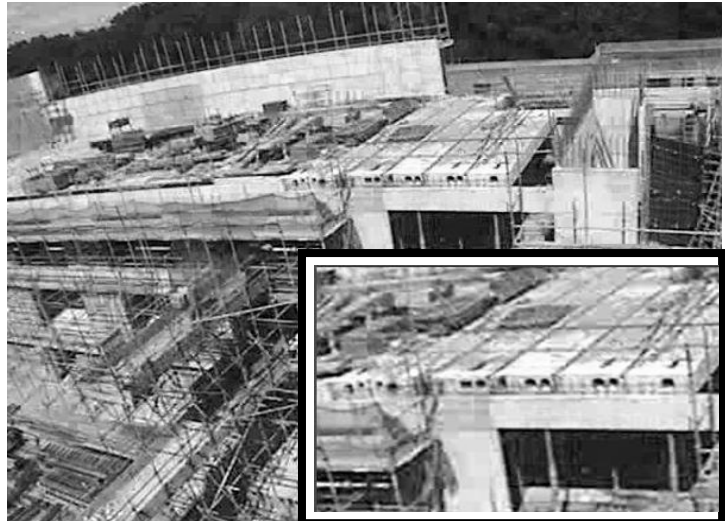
Construction of a "Termodeck" Building showing hollow slabs in inset
